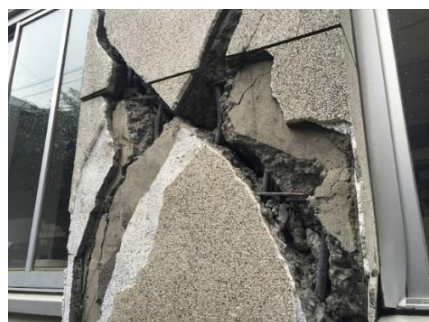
Close up view of typical columns failed in short column induced shear failure.
